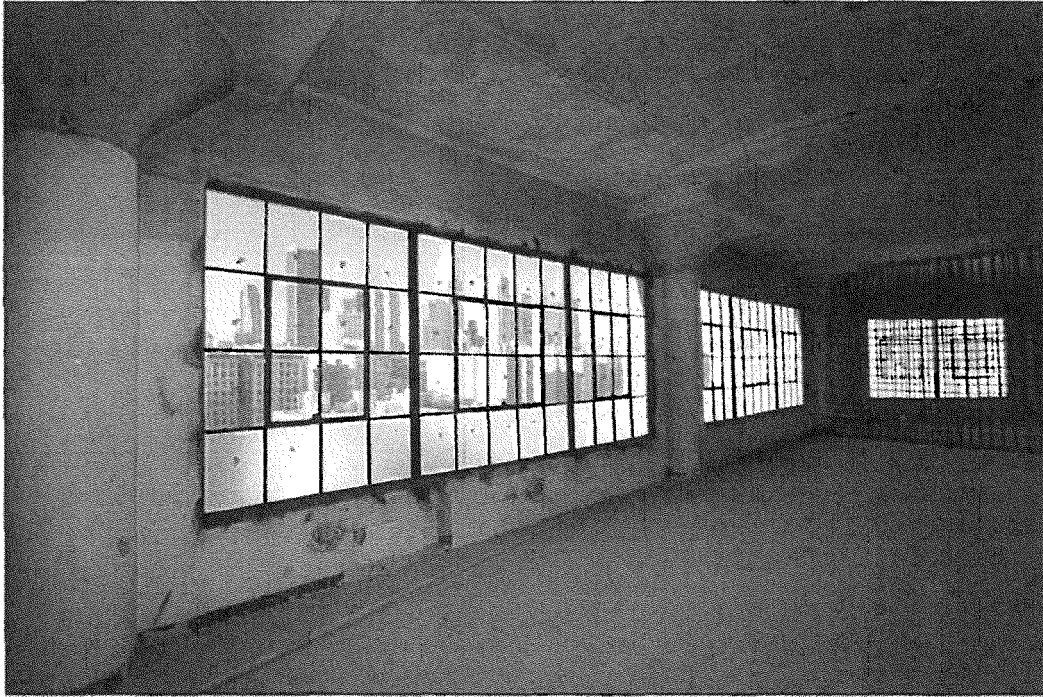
Maxfield Building, 819 S. Santee Street, interior view of typical upper floor open loft, during current adaptive reuse project (Chattel, 2014)
